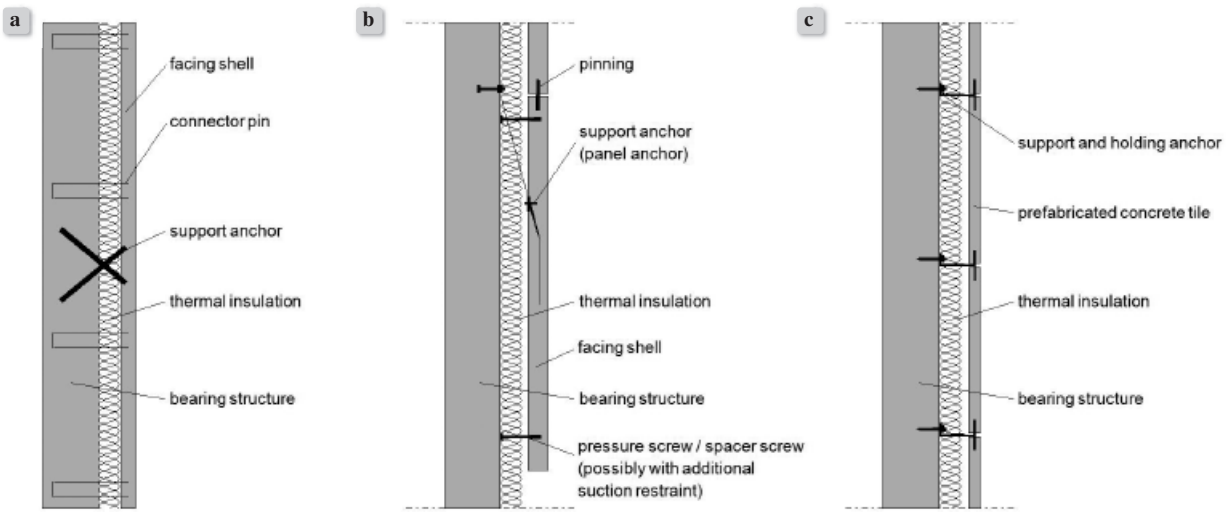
a) sandwich wall, b) curtain-wall facing, c) curtain-wall artificial stone
